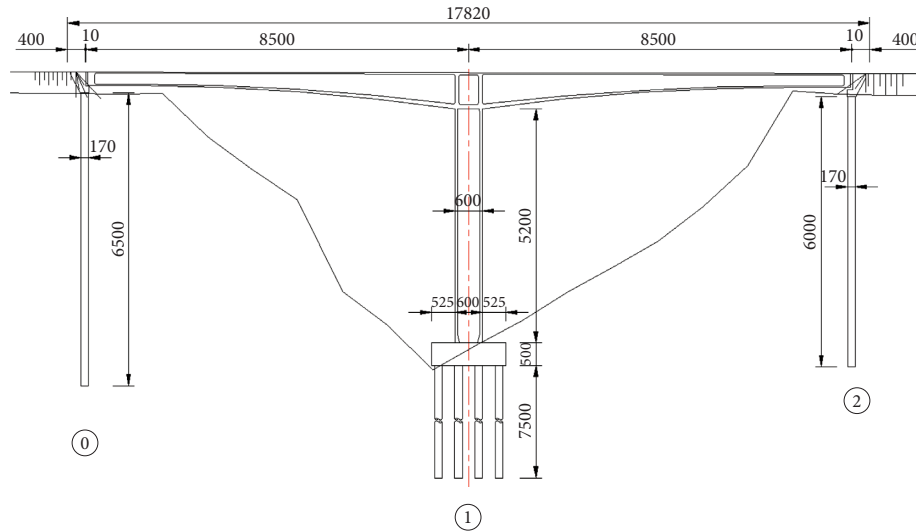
Elevation view of the T-shaped rigid frame bridge (all dimensions: cm).
